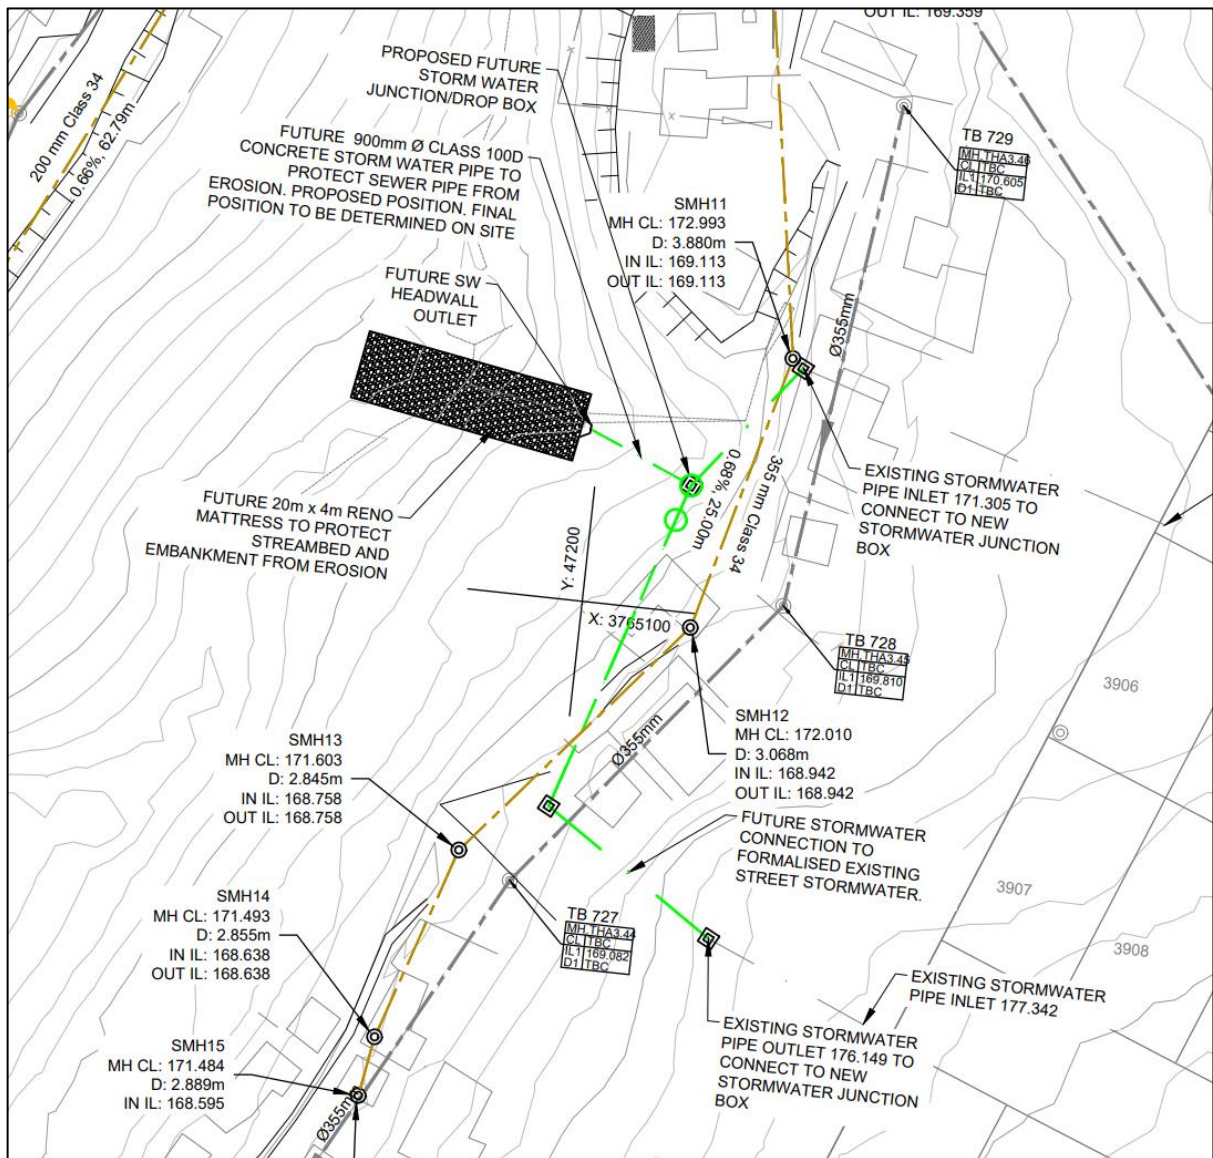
Proposed reno mattress (20m x 4m), stormwater headwalls, stormwater junction boxes and 900mm Ø stormwater pipes (Lukhozi Consulting Engineers (Pty) Ltd, 2024).
